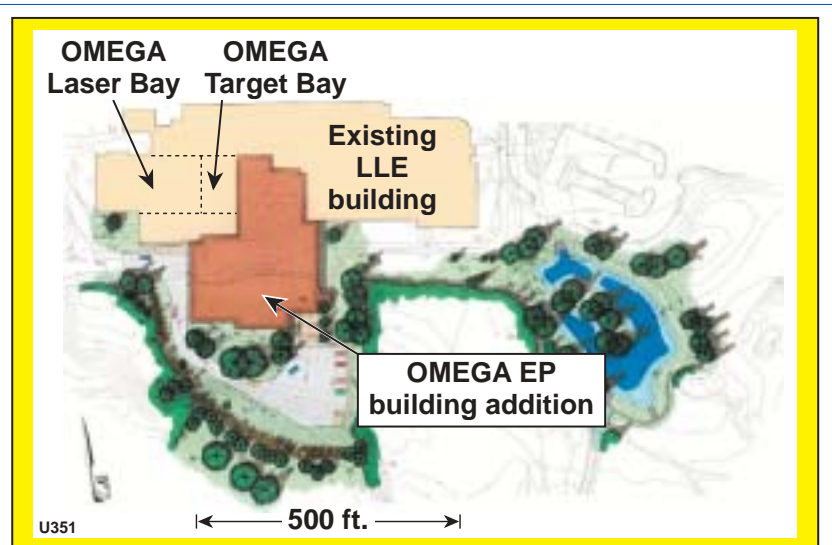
Drawing showing overall layout of the OMEGA EP building at its position relative to the existing LLE facility.
